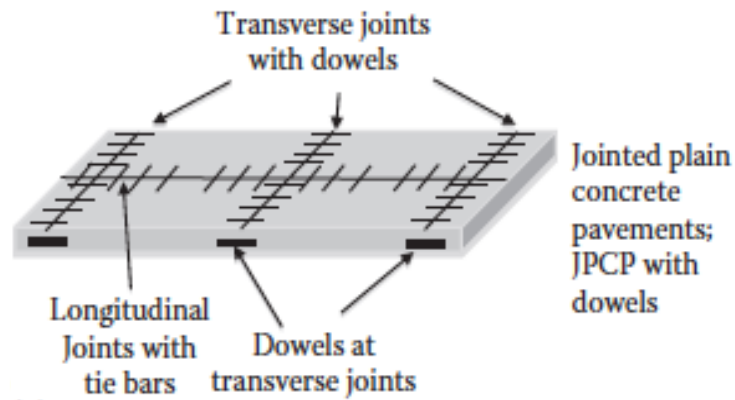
Jointed Plain Concrete Pavement (El-Korchi & Mallick, 2013)
